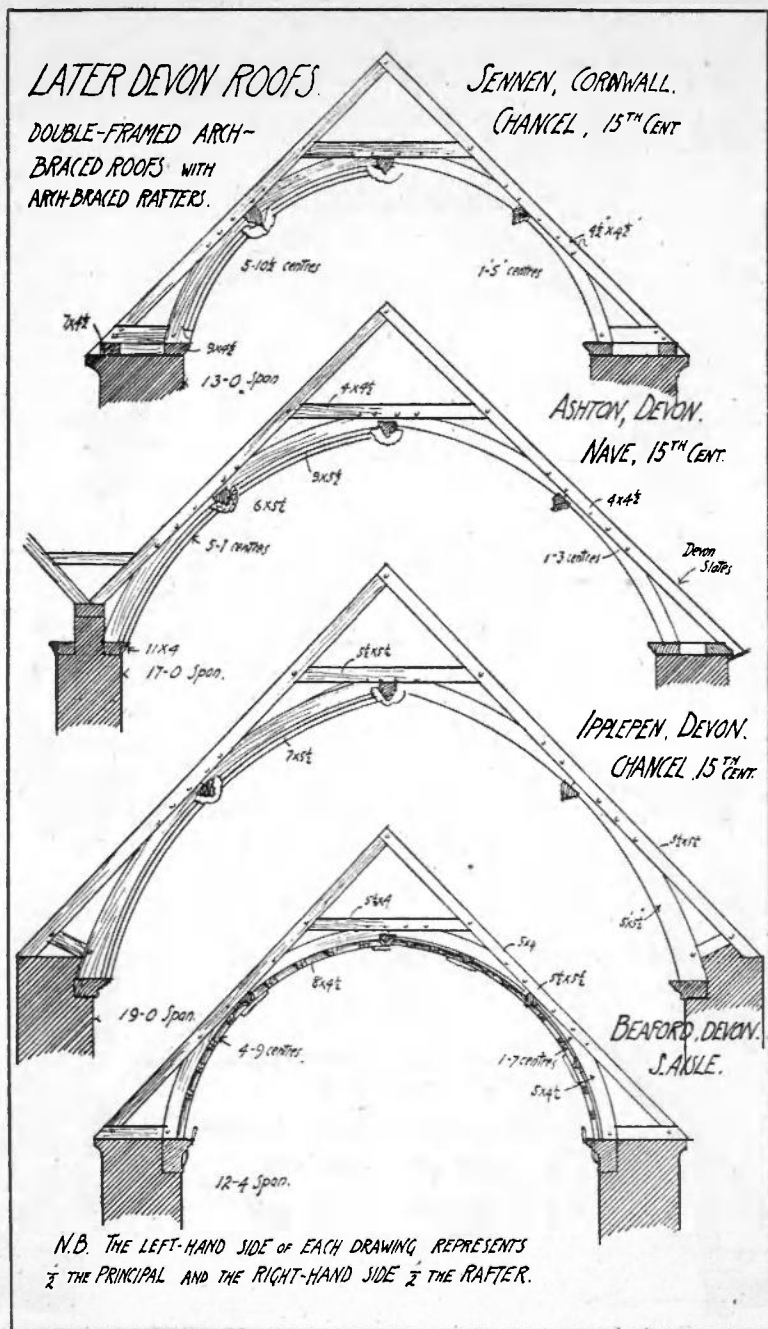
ARCH-BRACED ROOFS, DOUBLE-FRAMED, WITH ARCH-BRACED RAFTERS.
